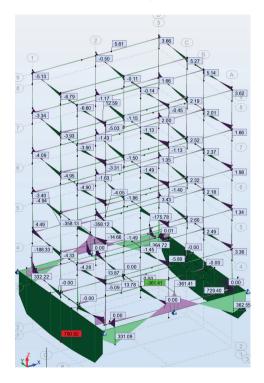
Overview of six-story building structural modelling, M_y diagrams
